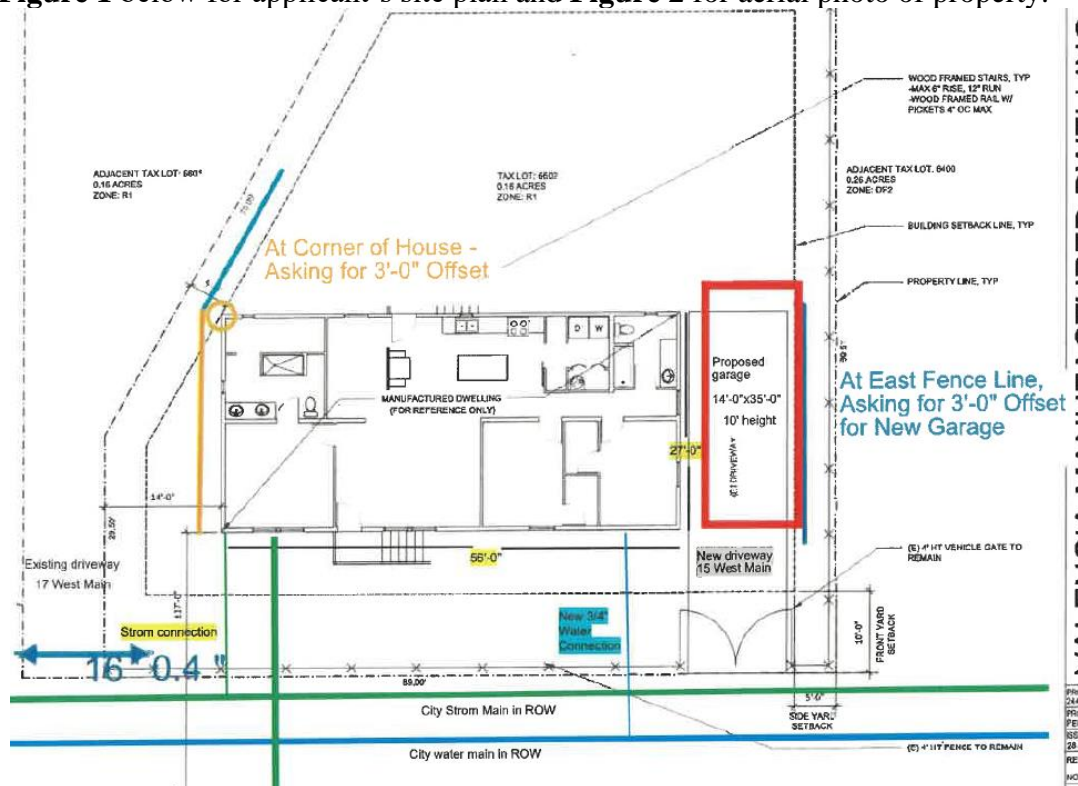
Applicant's site plan showing two variances to side yard setbacks.
